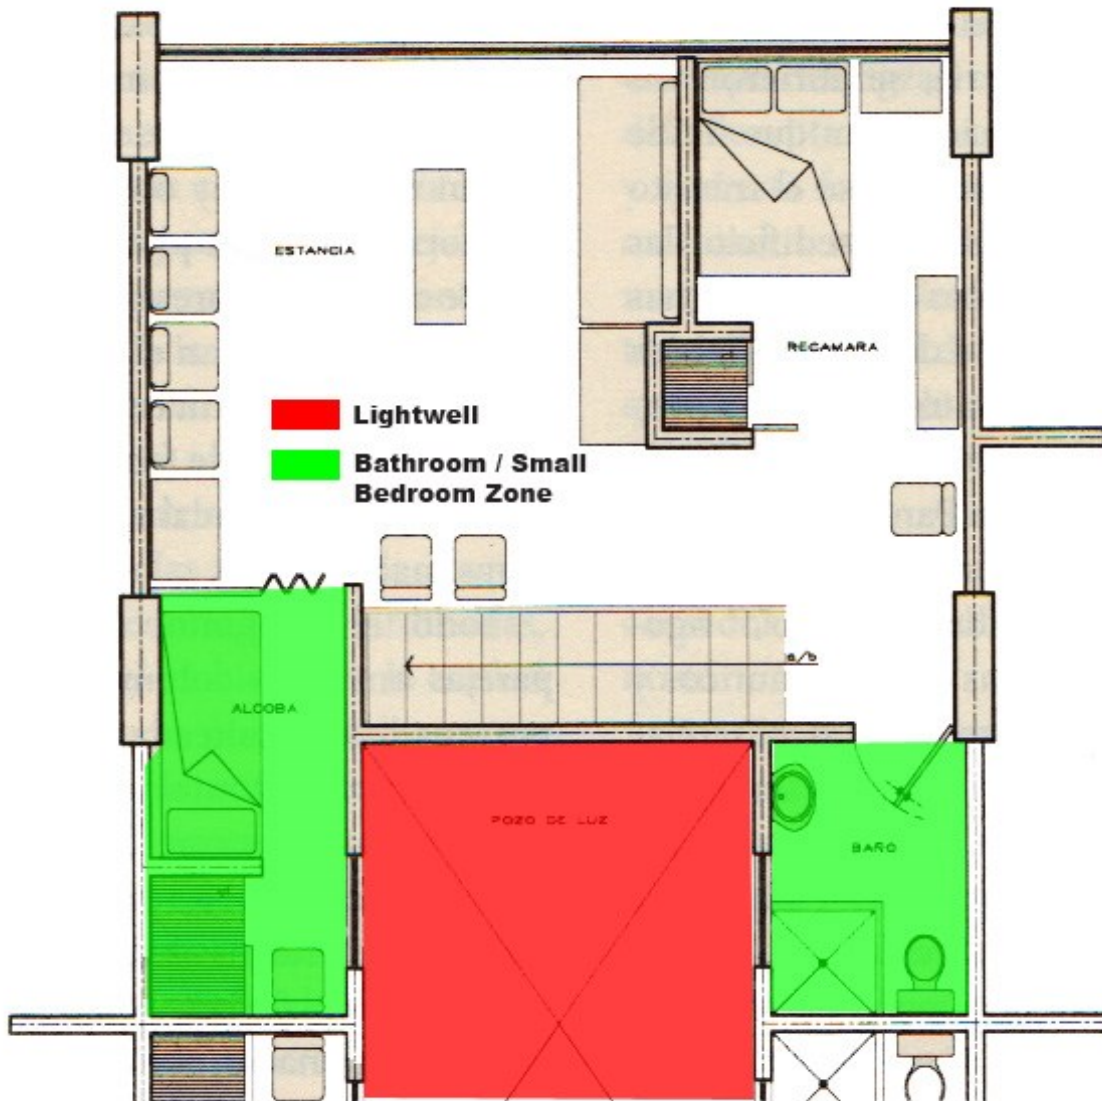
Apartment Type A Lower (or Upper) Floorplan with Lightwells.
